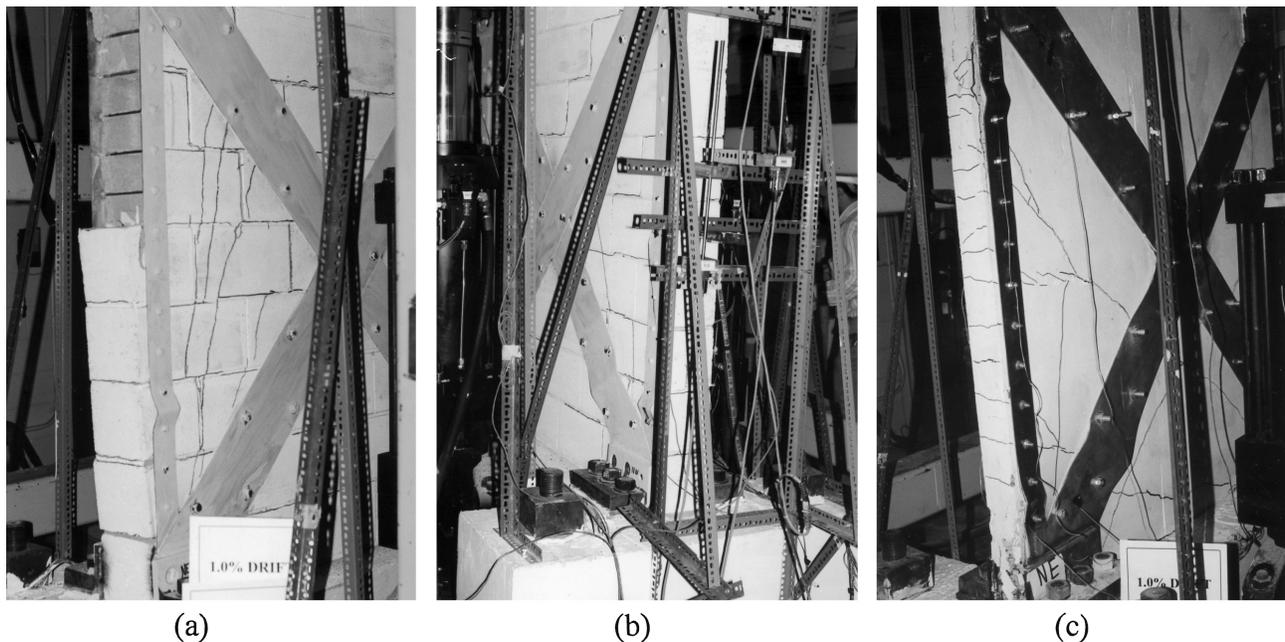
Damage at 1.0% Drift for: (a) Wall 9R; (b) Wall 10R; (c) Wall 11R
